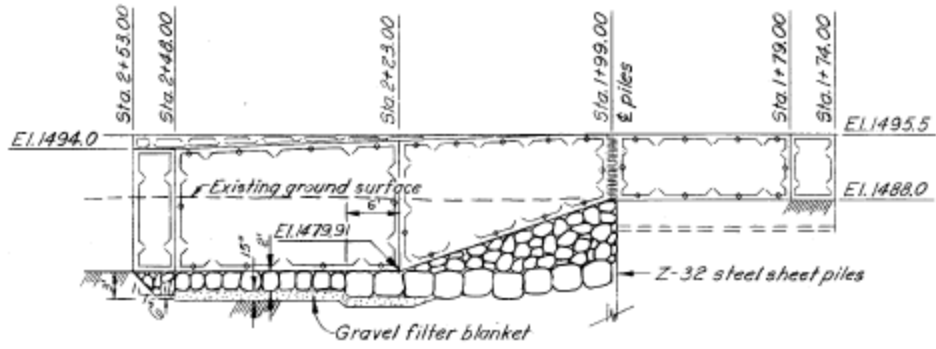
Steel Sheet Pile Weir Cross Section 3000 Feet Upstream of W.A. &G Bridge
